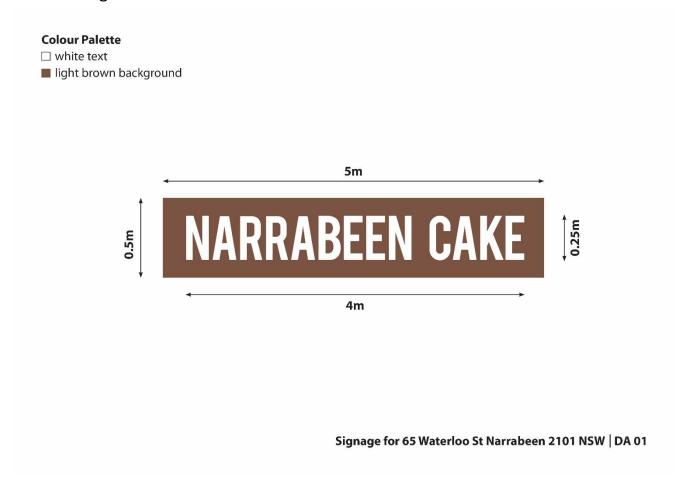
Proposed awning fascia signage at 65 Waterloo Street.
